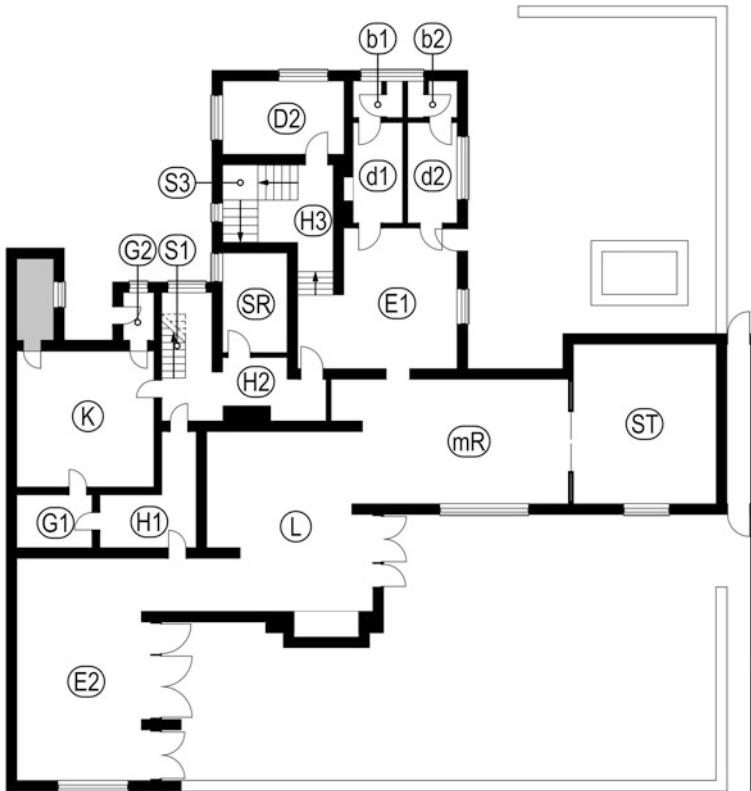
Annotated second floor plan of the *Wolf House
